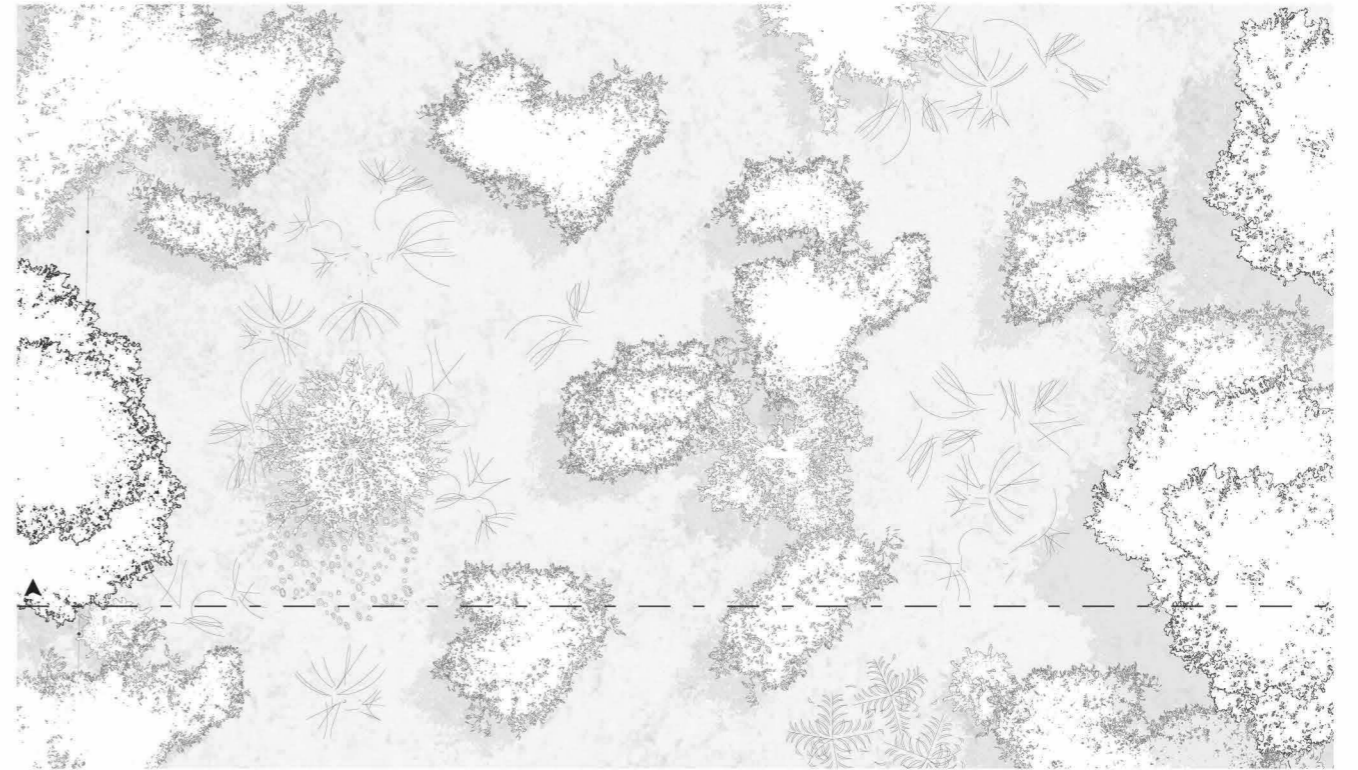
Plan, year 10 (Scale 1:200 - A3)
